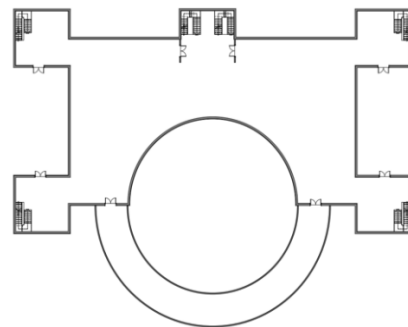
Building Plan with Staircase Location at Lower Ground Library of UII
